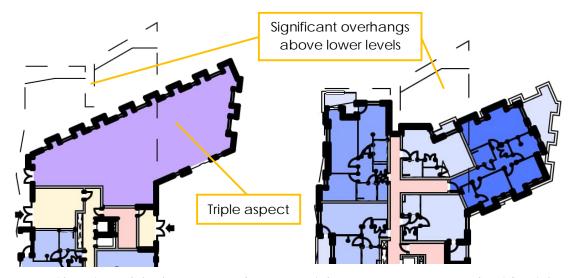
Plan view of the lower ground commercial space & upper ground residential use
